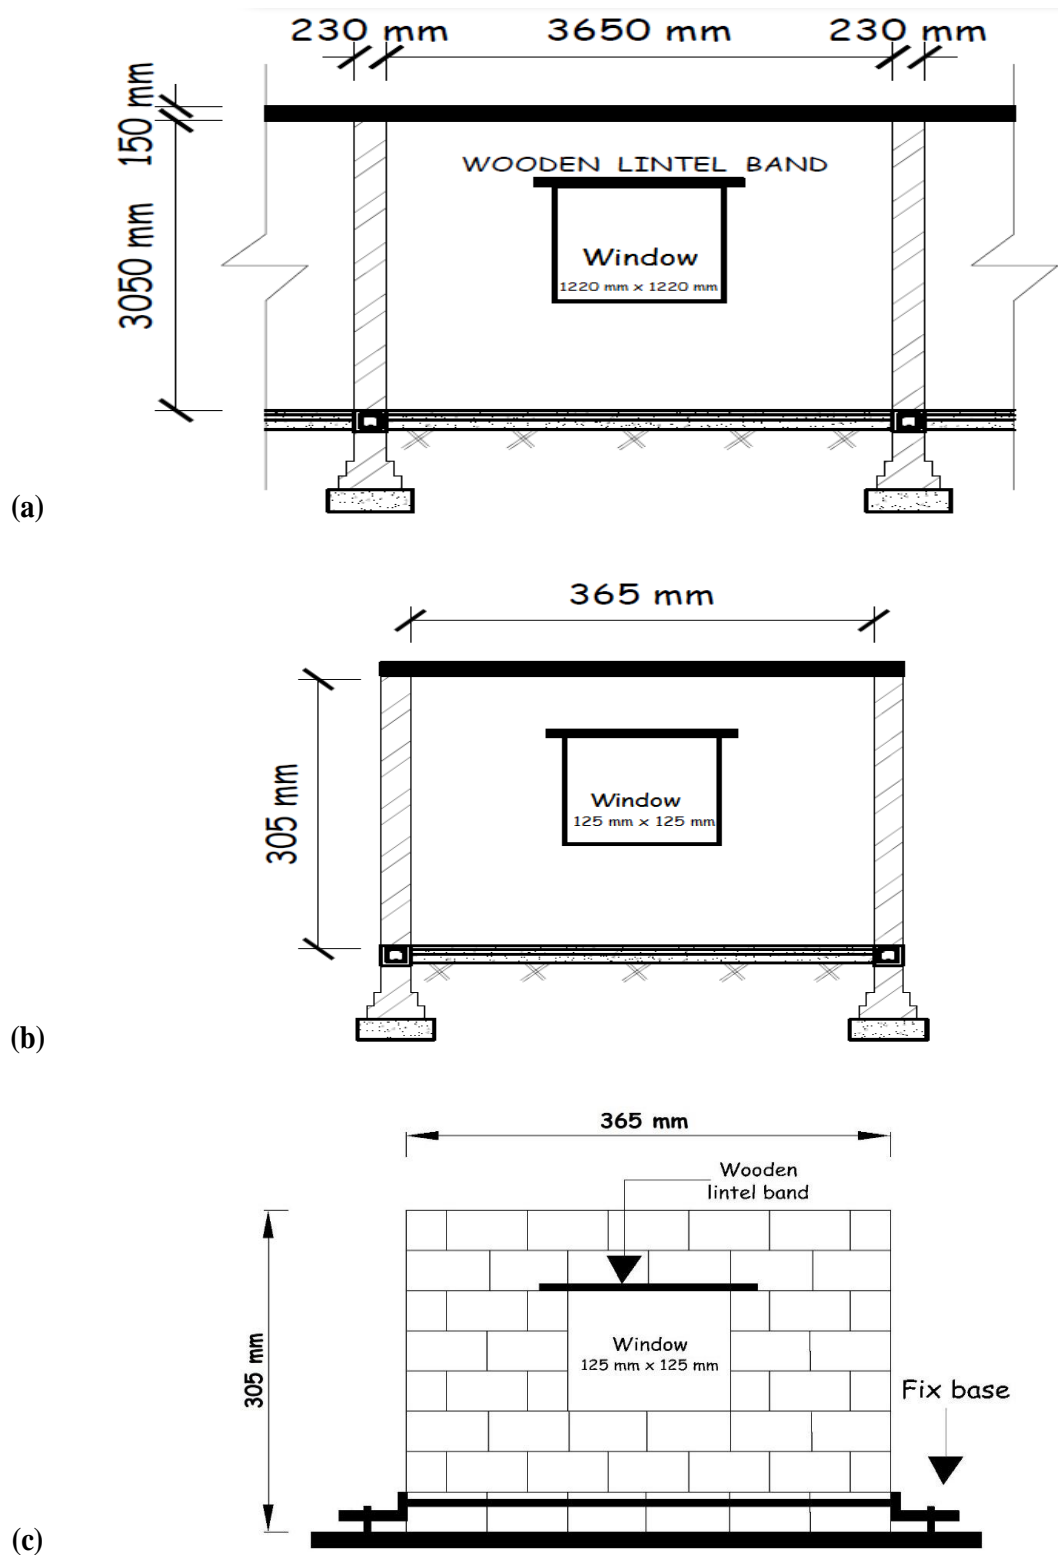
Schematic diagram of unreinforced brick masonry wall with opening a) proposed real wall b) scaled down prototype wall c) prototype wall with simplified boundary conditions
